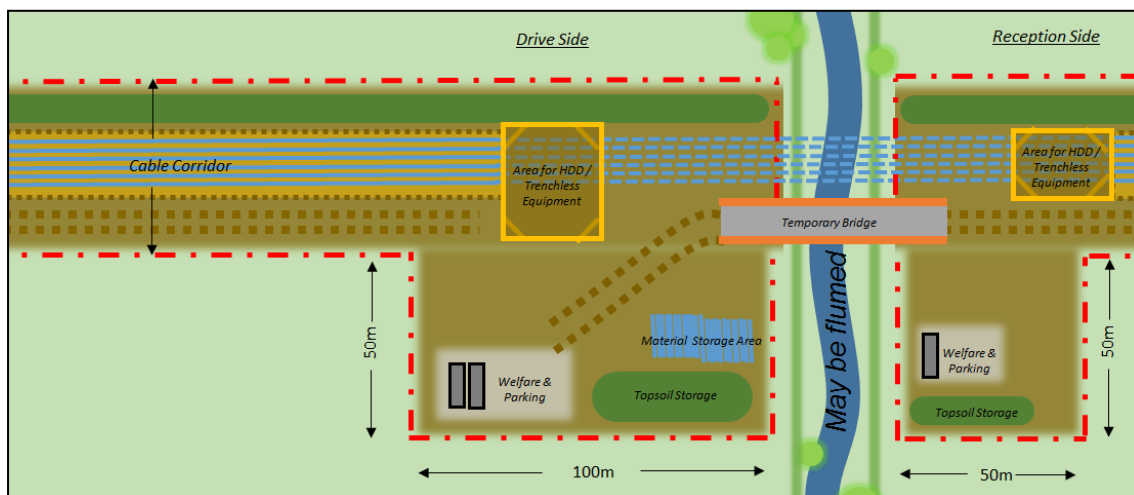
Indicative trenchless river crossing with temporary bridge
